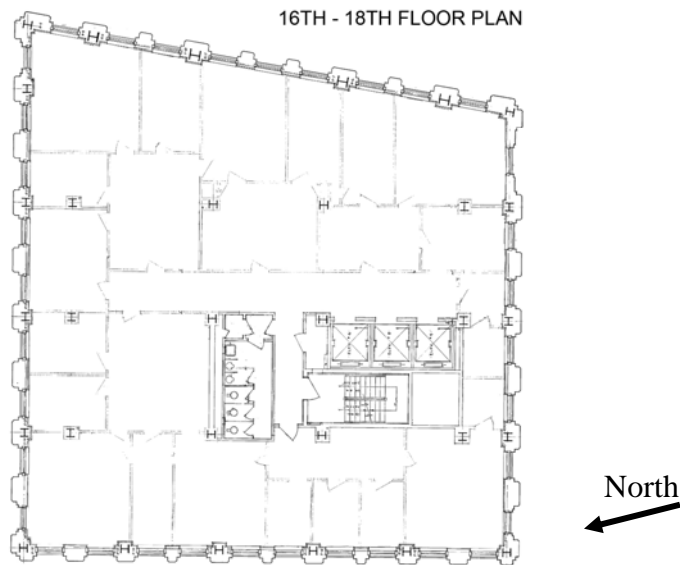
Typical floor plan in the tower, 16th to 18th floors.
